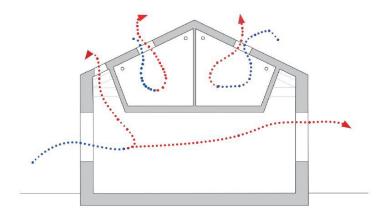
Summer: natural ventilation through windows and rooflights. Two cabins shown but one larger cabin with two beds is an option.
